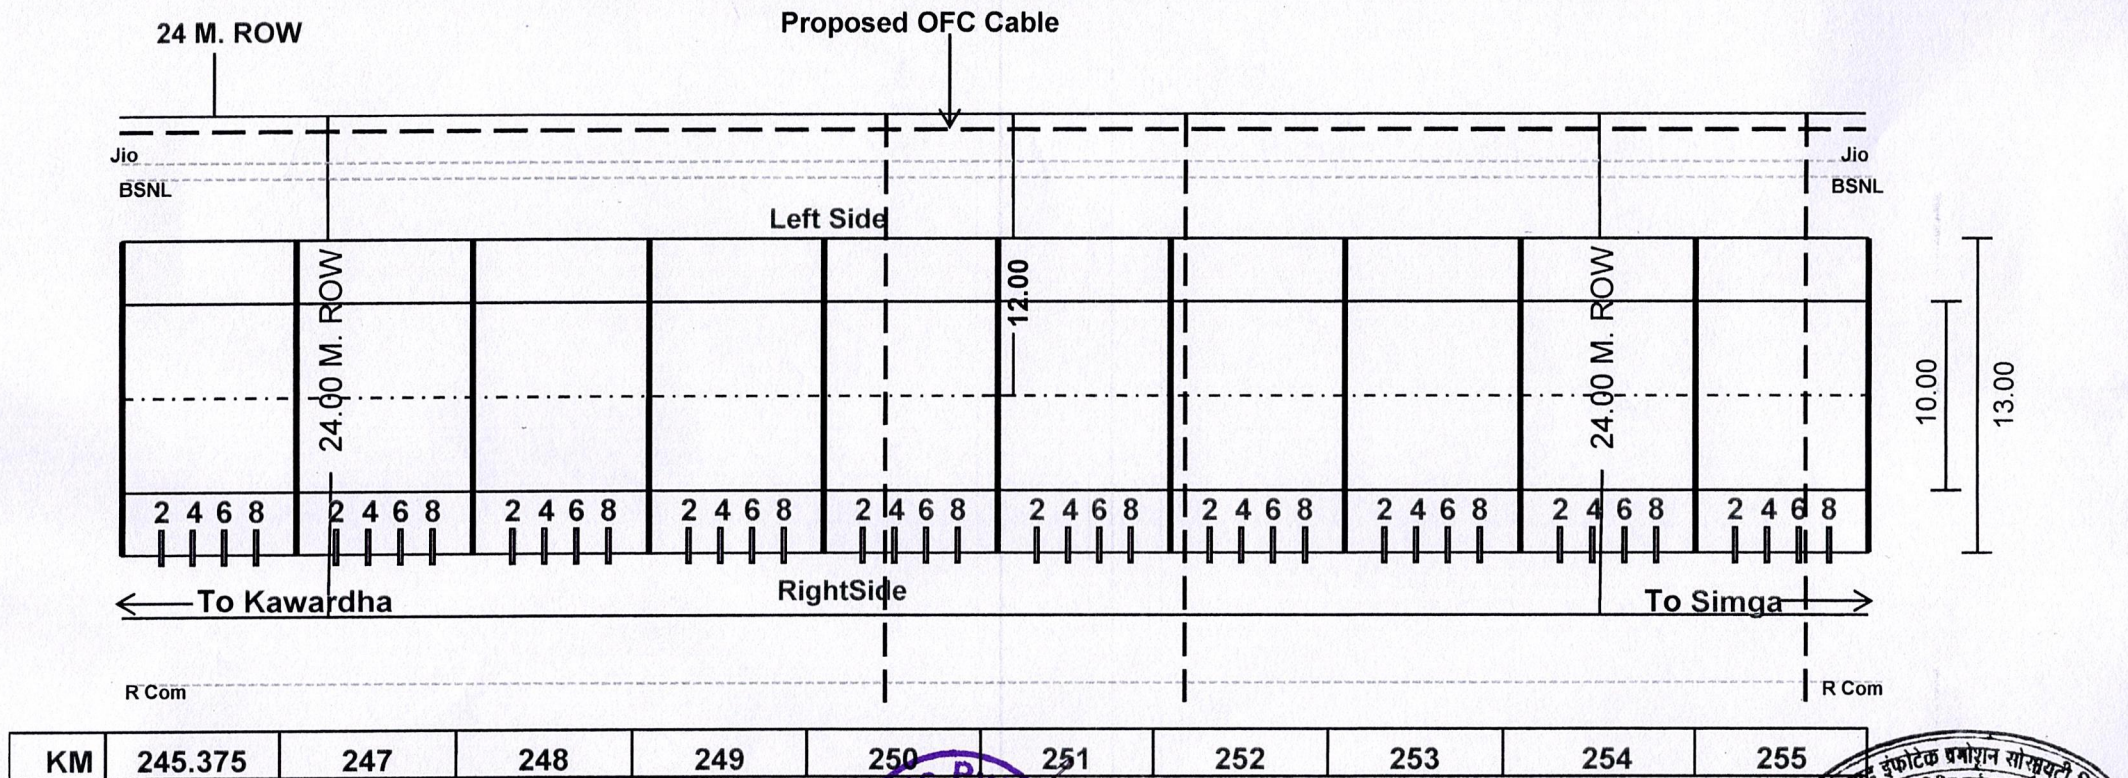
## DETAILS OF NATIONAL HIGHWAY FOR ROW APPLICATION
